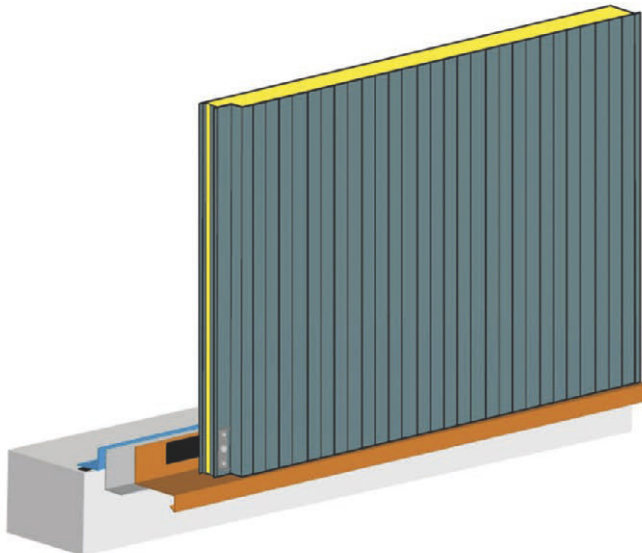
Cladding base Vertically installed panels with through-fixings on steel support
